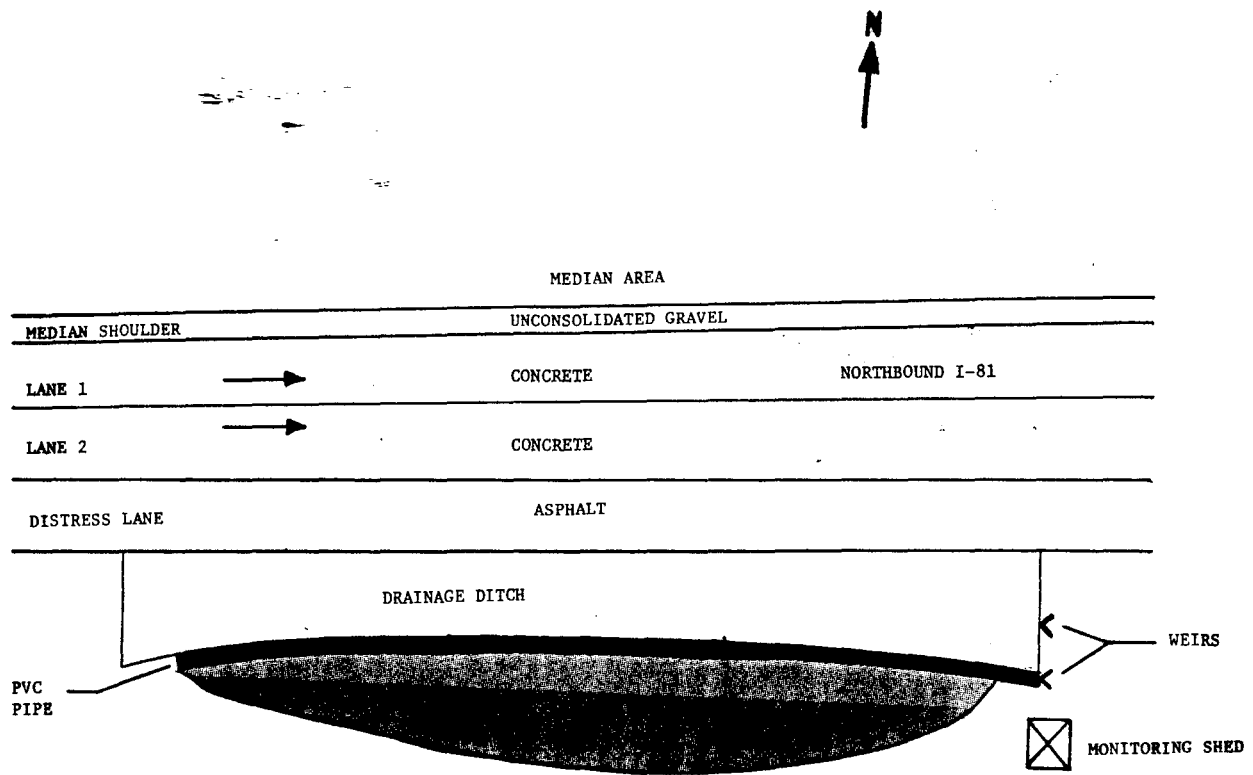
Schematic drainage plan - Harrisburg I-81 site.
